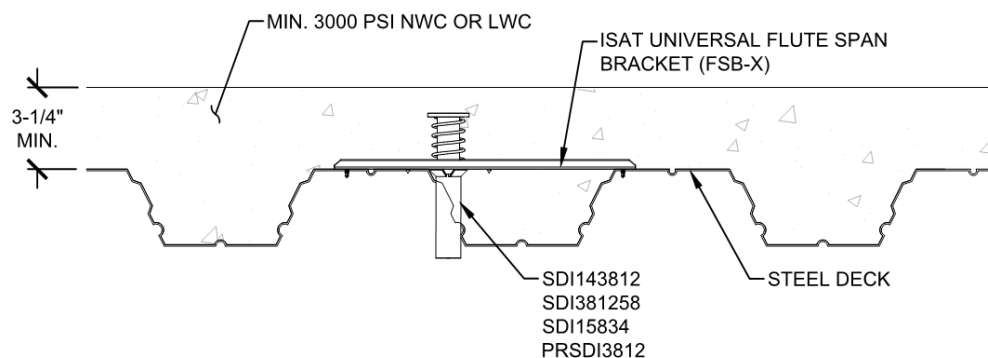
B - SDI AND PRSDI3812 INSERTS INSTALLATION IN THE SOFFIT OF CONCRETE FILLED METAL DECK FLOOR AND ROOFASSEMBLIES ABOVE LOWER FLUTE (W-DECK) – ELEVATED
